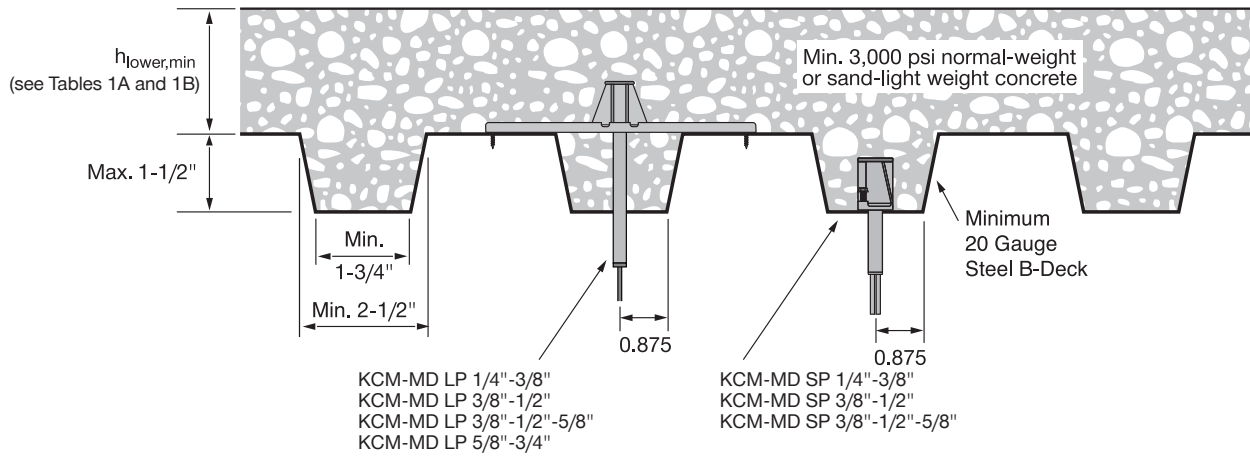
C — Installation in the soffit of concrete filled metal deck floor and roof assemblies-over lower flute (B-deck)
